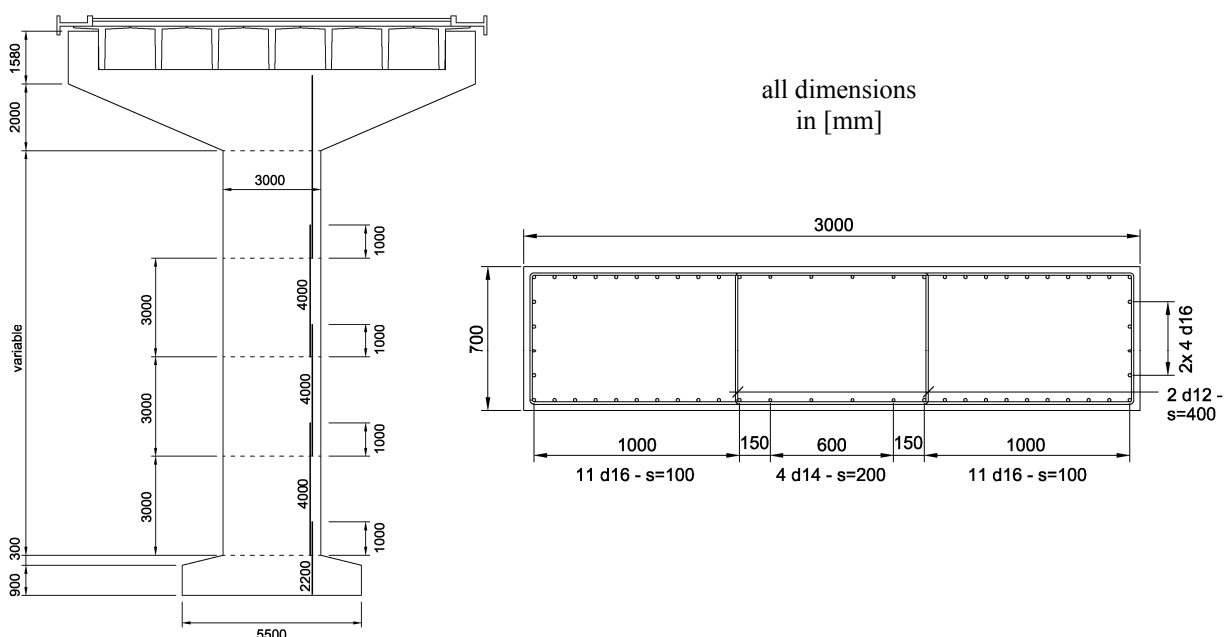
Pier of Viadukt Untere Weid (SG), left: Elevation, right: Cross-section
